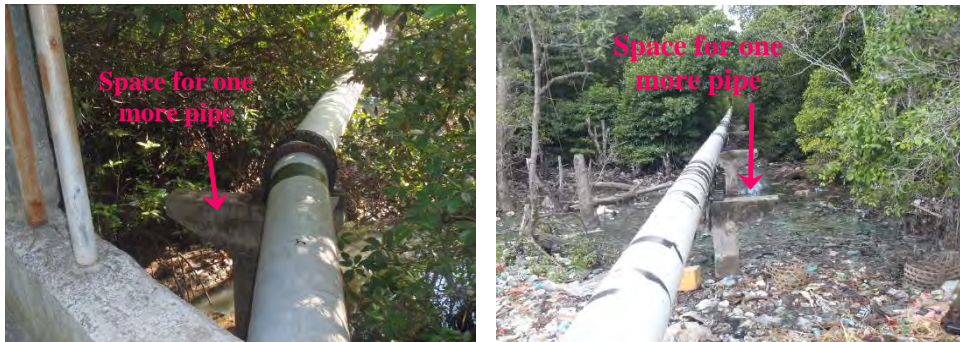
b.6 View of the Existing Transmission Pipeline from Estuary Water Purification Plant and the Space for the Installation of Another Pipe on the Bridge Support Structure
